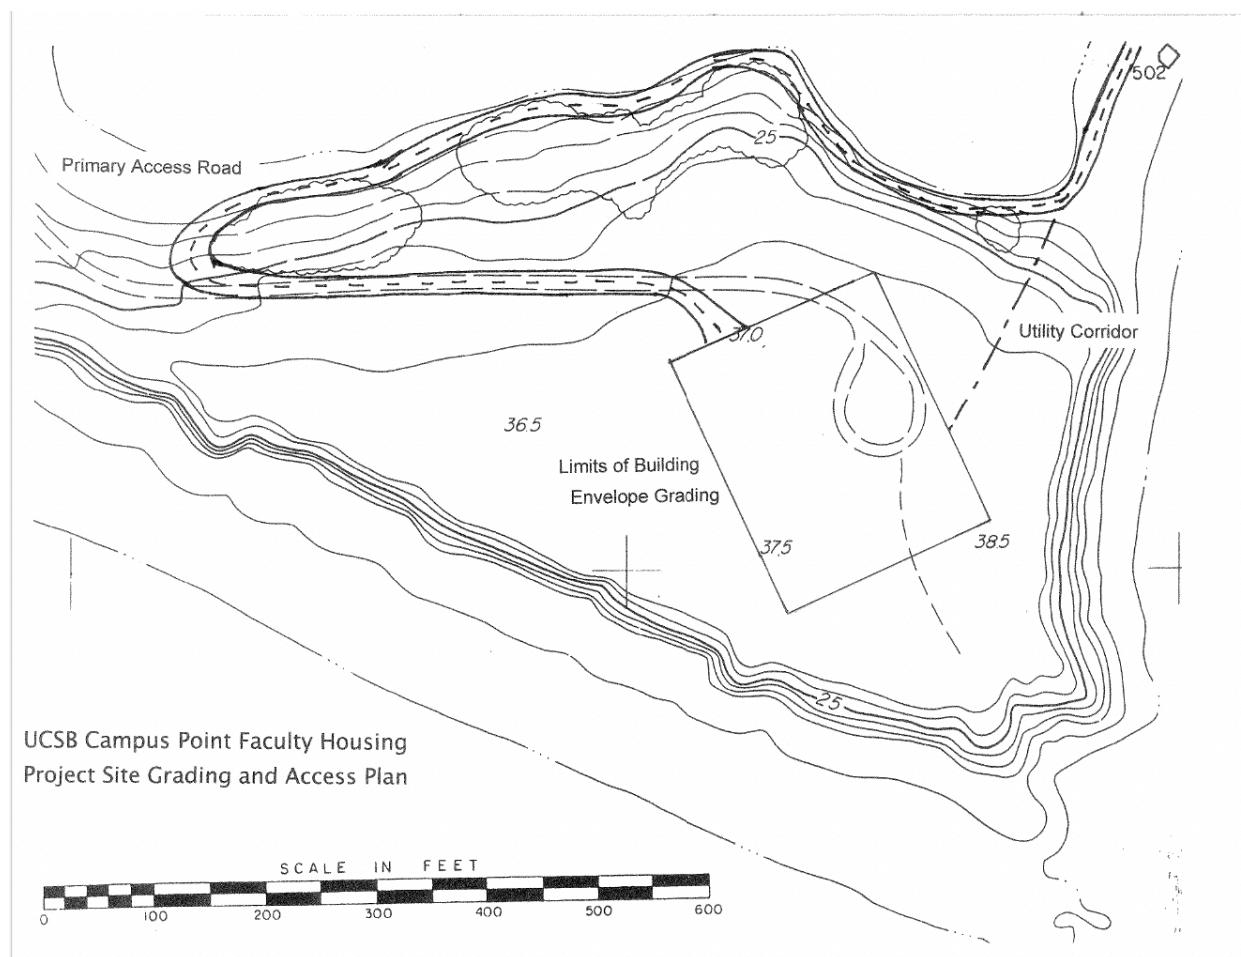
Project Site Grading Plan (Each contour line represents 5 feet of elevation).
